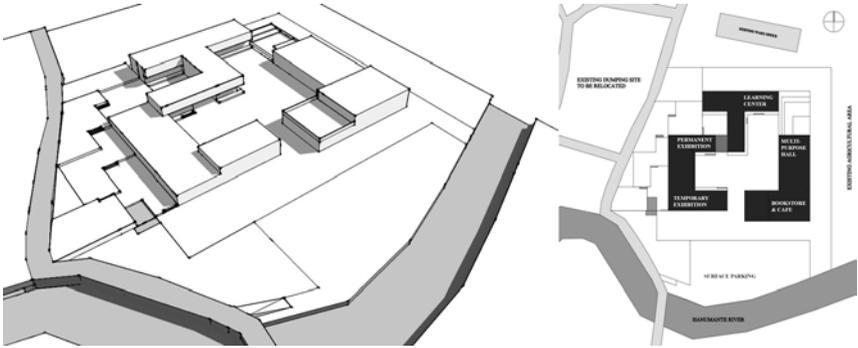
Aerial view and Nolli plan of Eliza's scheme.
